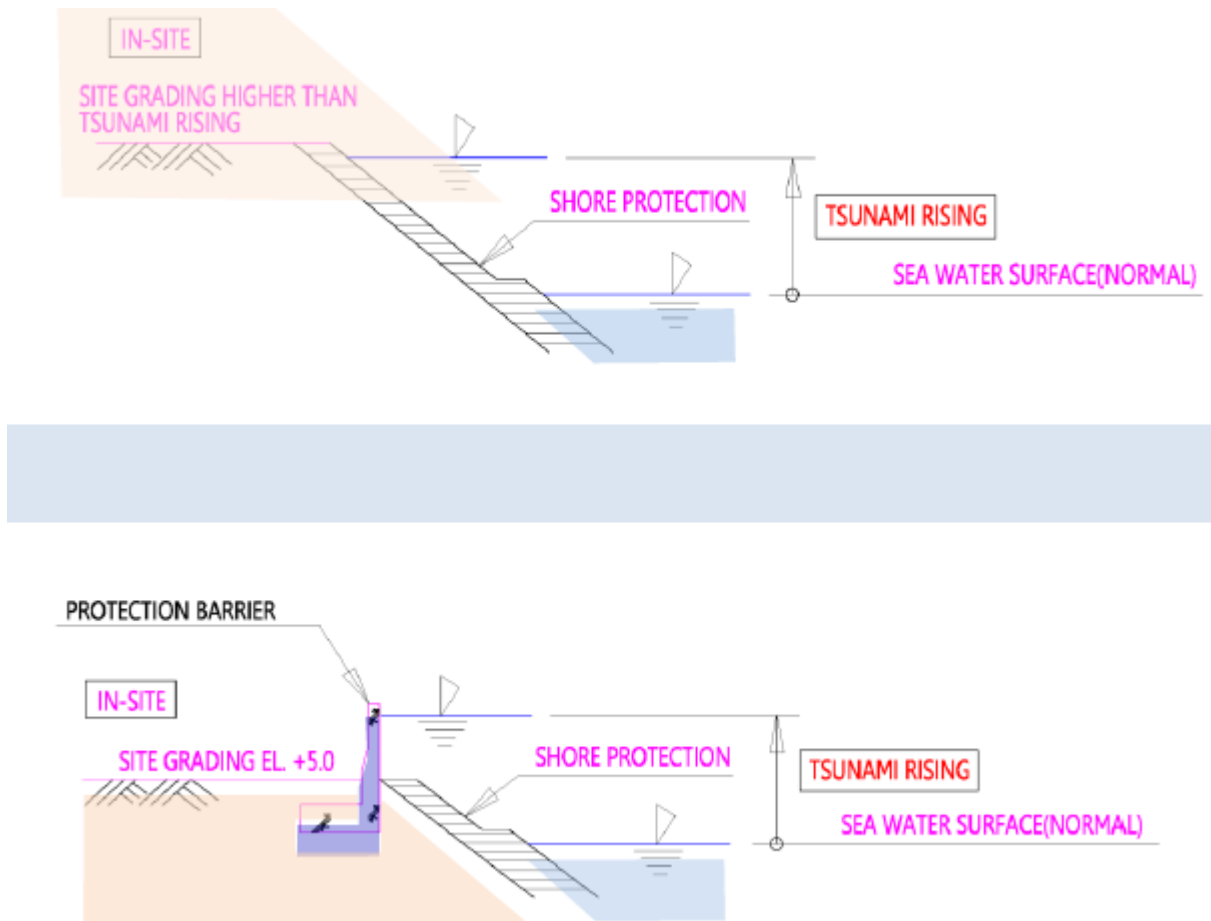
Initial Conceptual Plan for Protection Against Tsunamis
